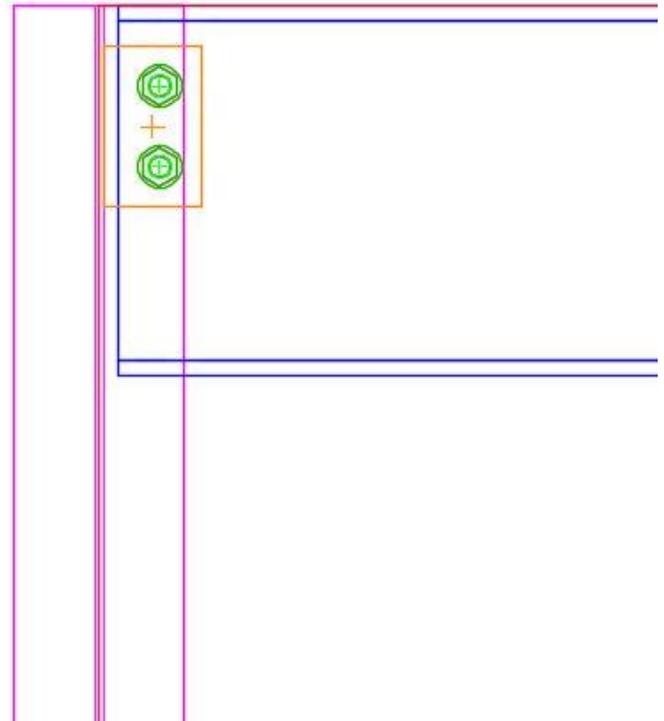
Elevation of Column & Beam shear plate connection in 2D wireframe.
